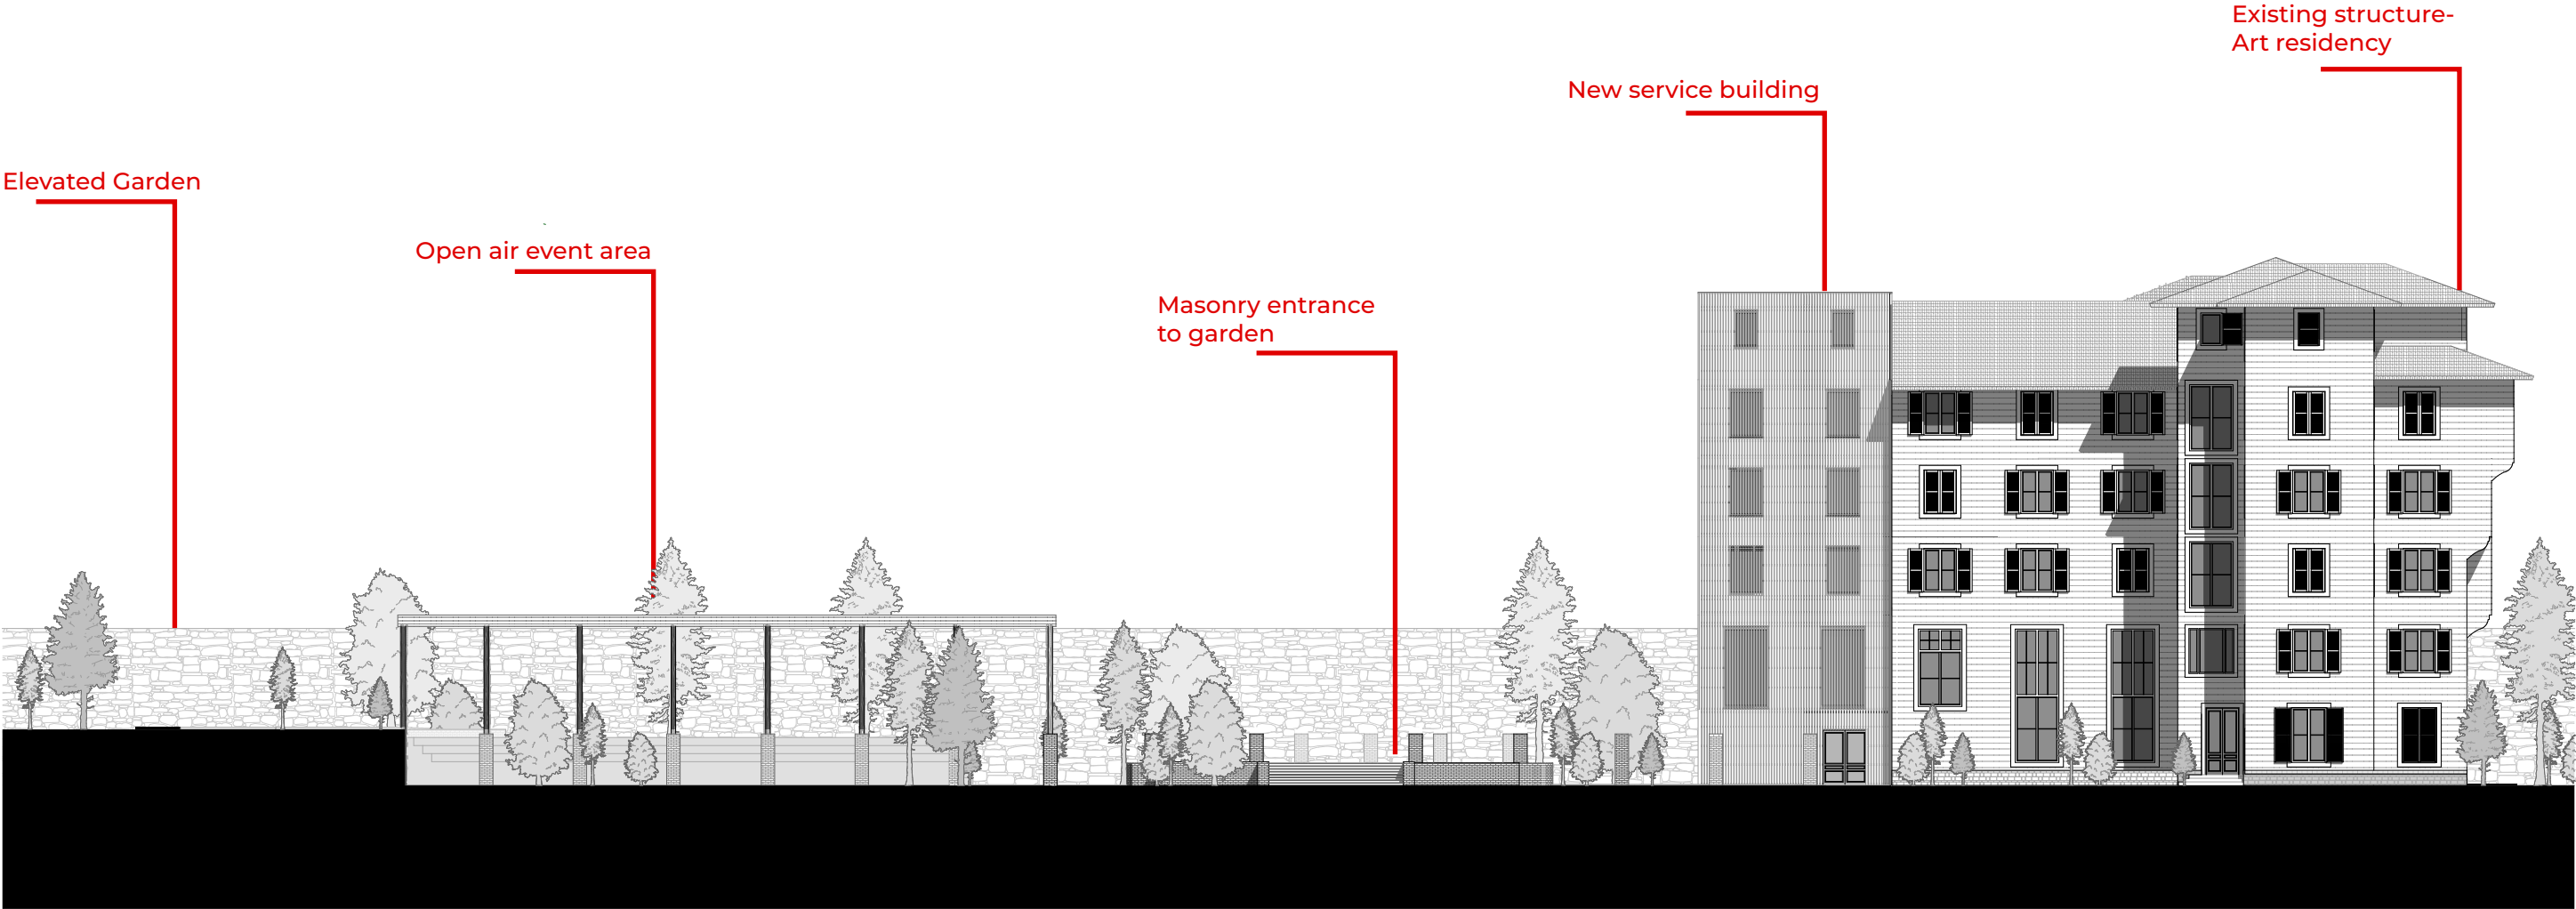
Southeast Elevation (Source: Created by the author, 2025)
